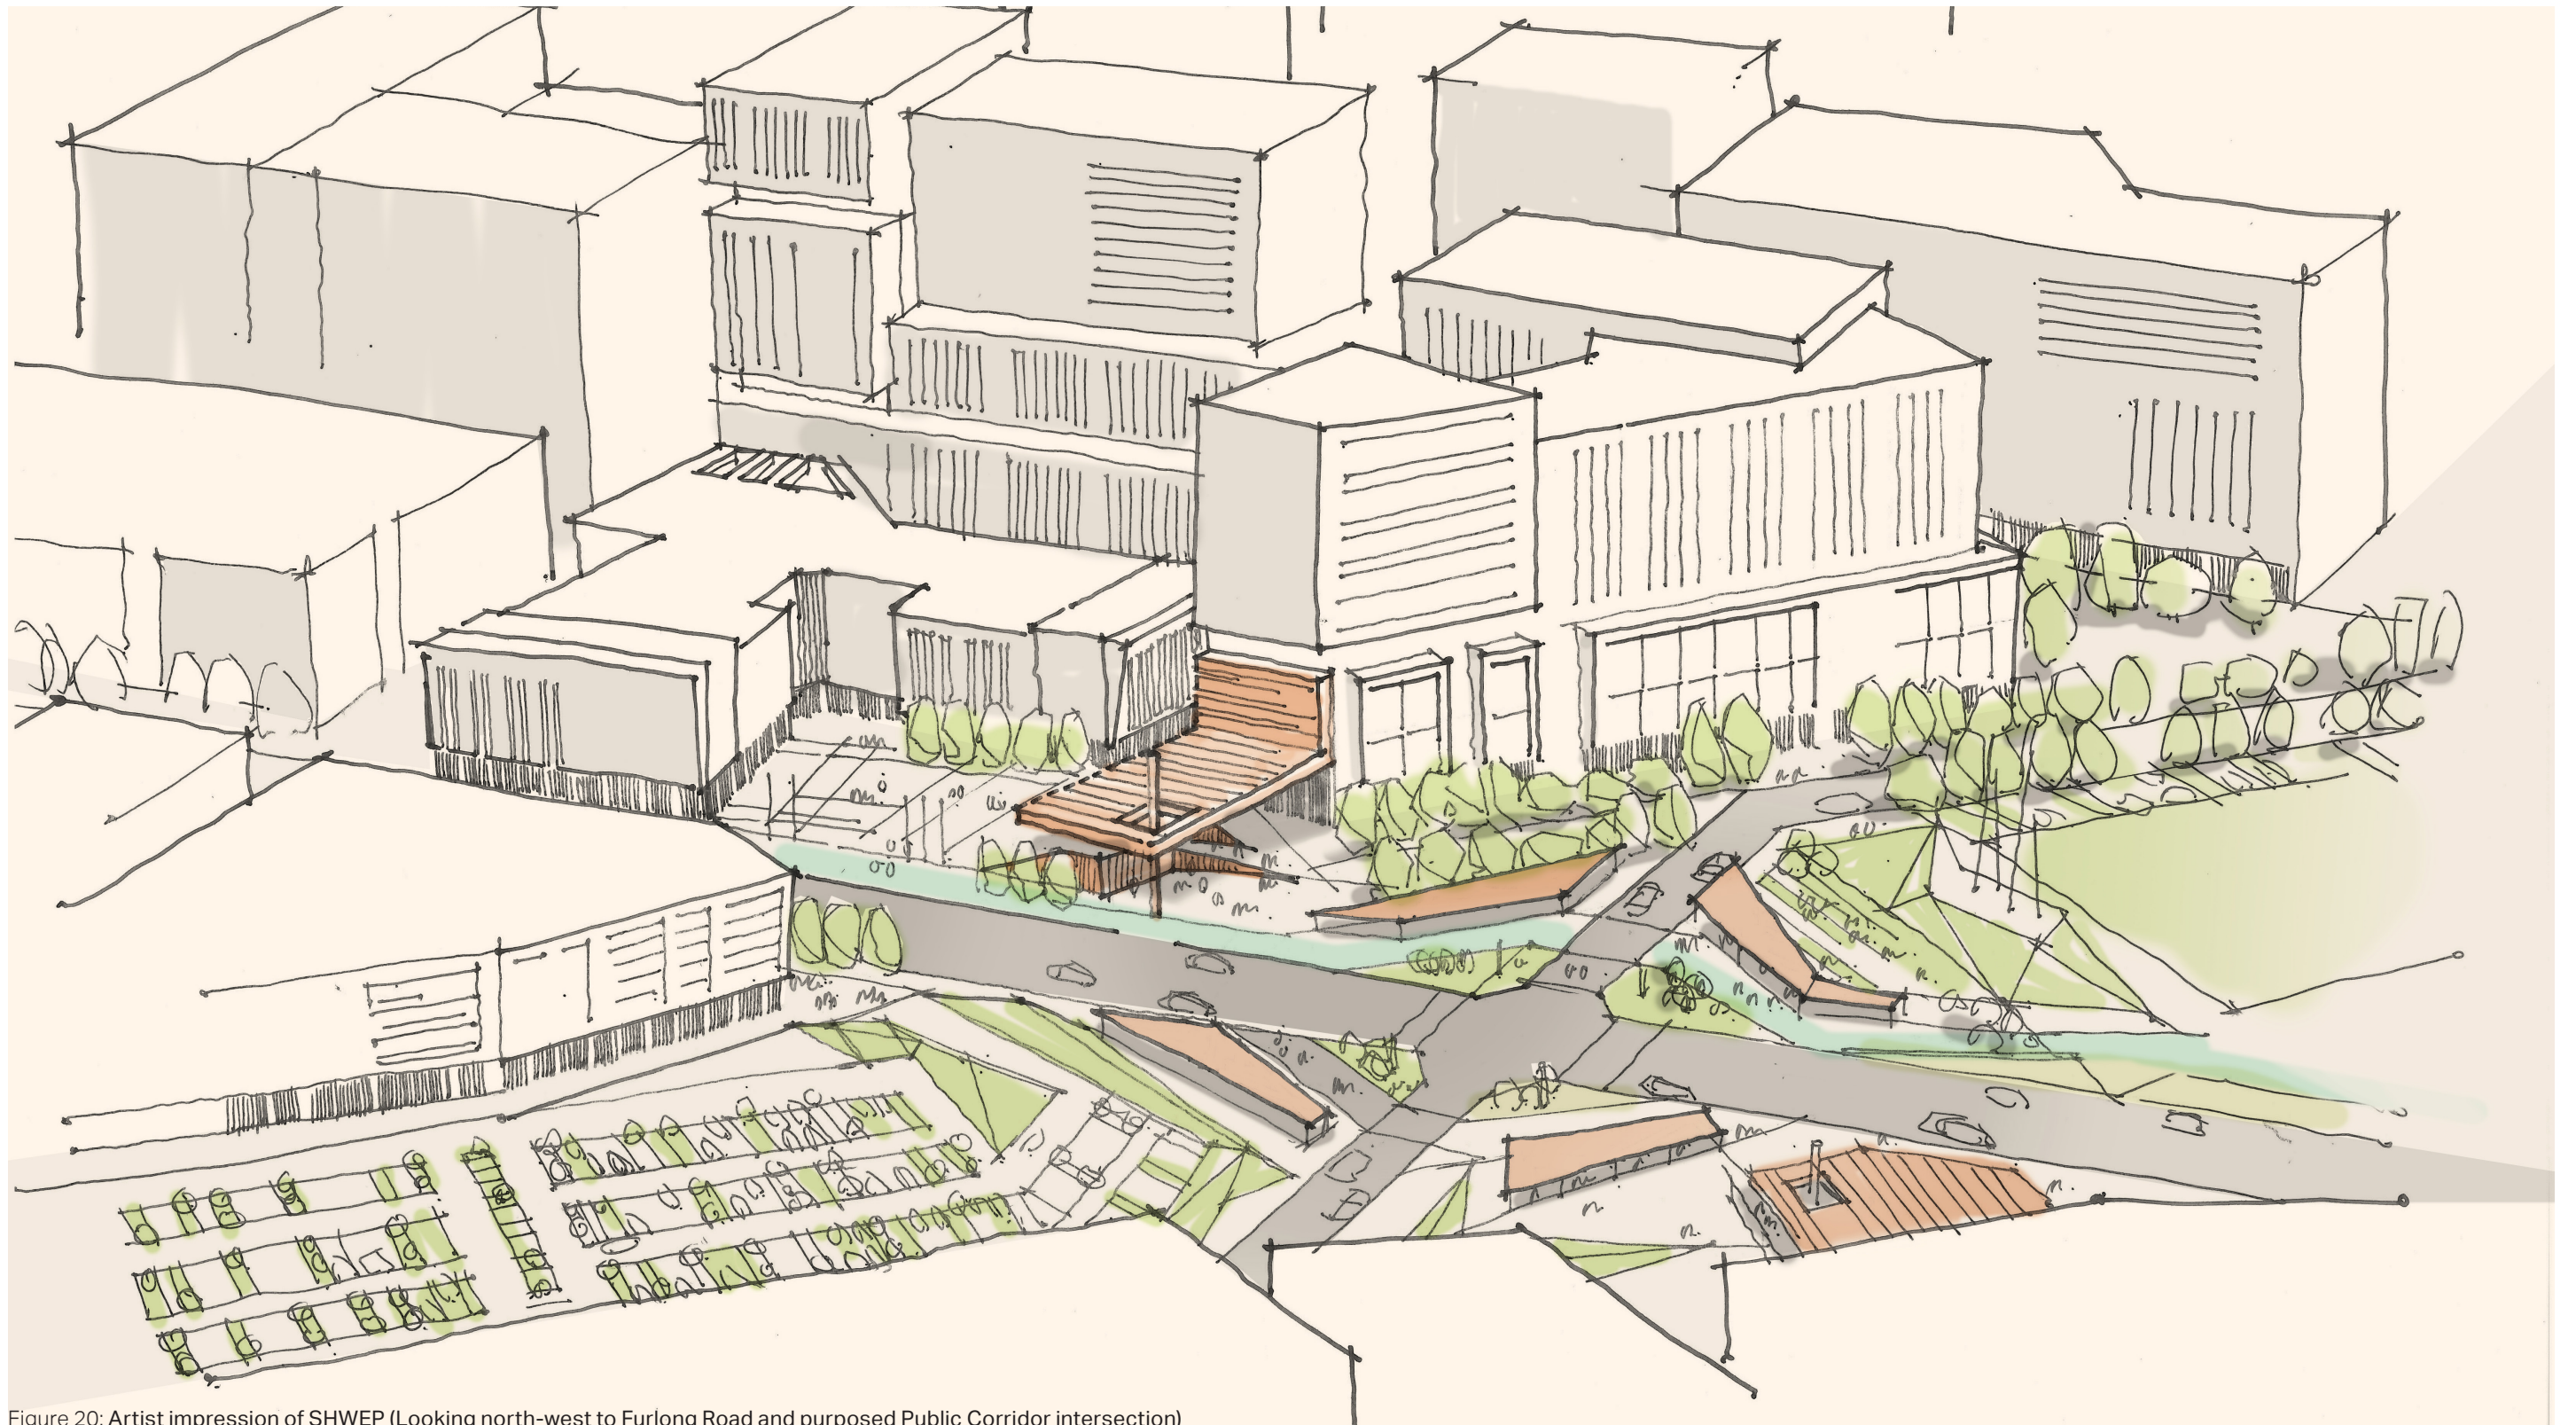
Artist impression of SHWEP (Looking north-west to Furlong Road and proposed Public Corridor intersection)
